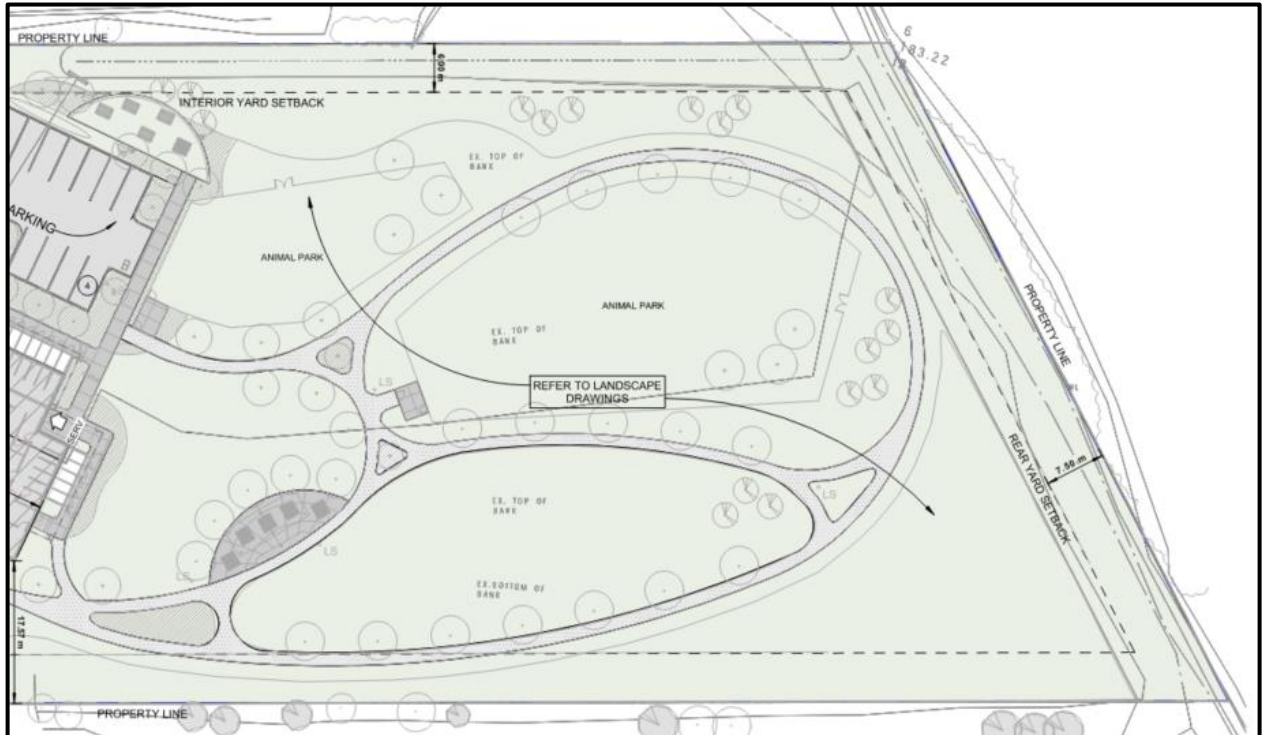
Excerpt of Overall Site Plan showing the amenity areas, open space, pet-supportive parks, and trail network proposed for the development.
